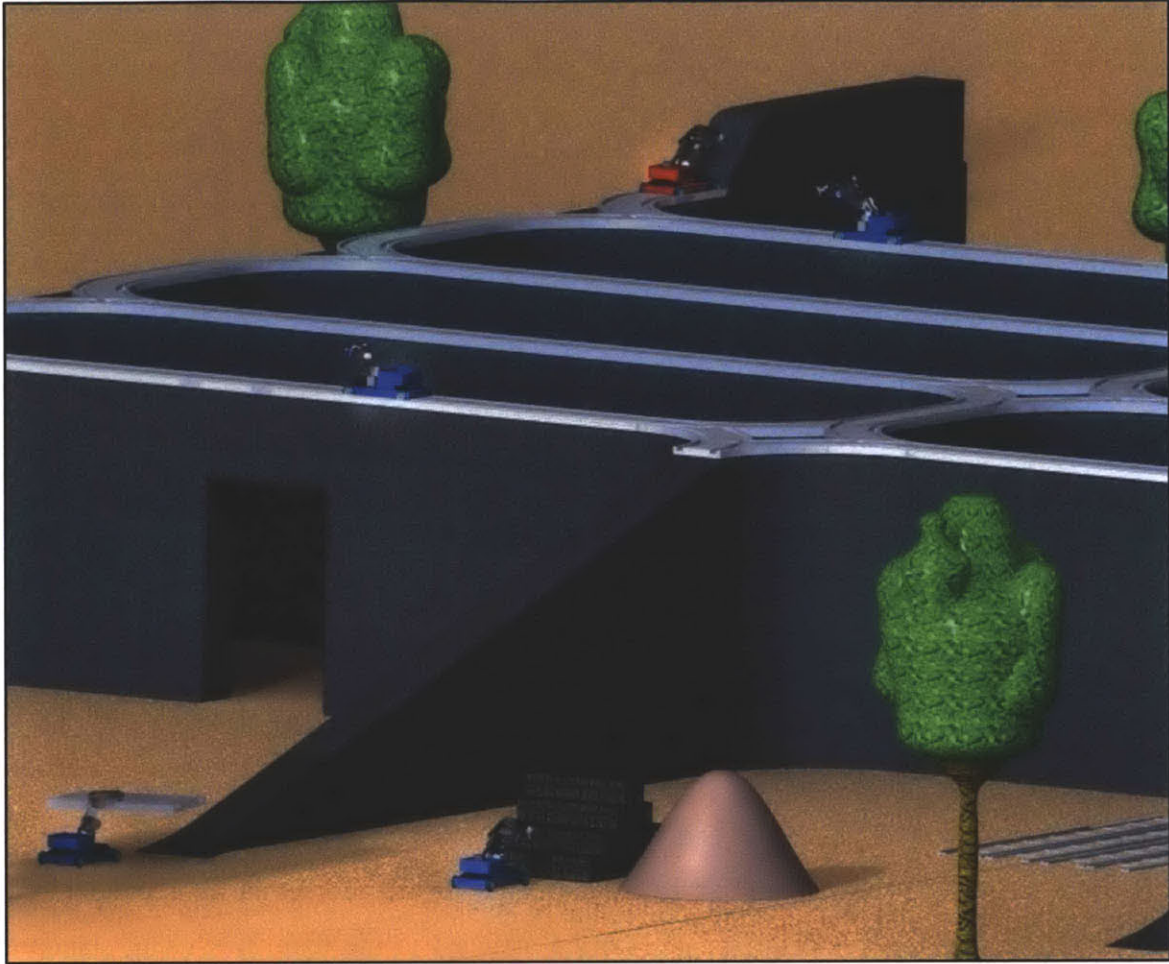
A rendering detailing how a group of mobile robots could work together to construct larger structures using swarm printing techniques.
